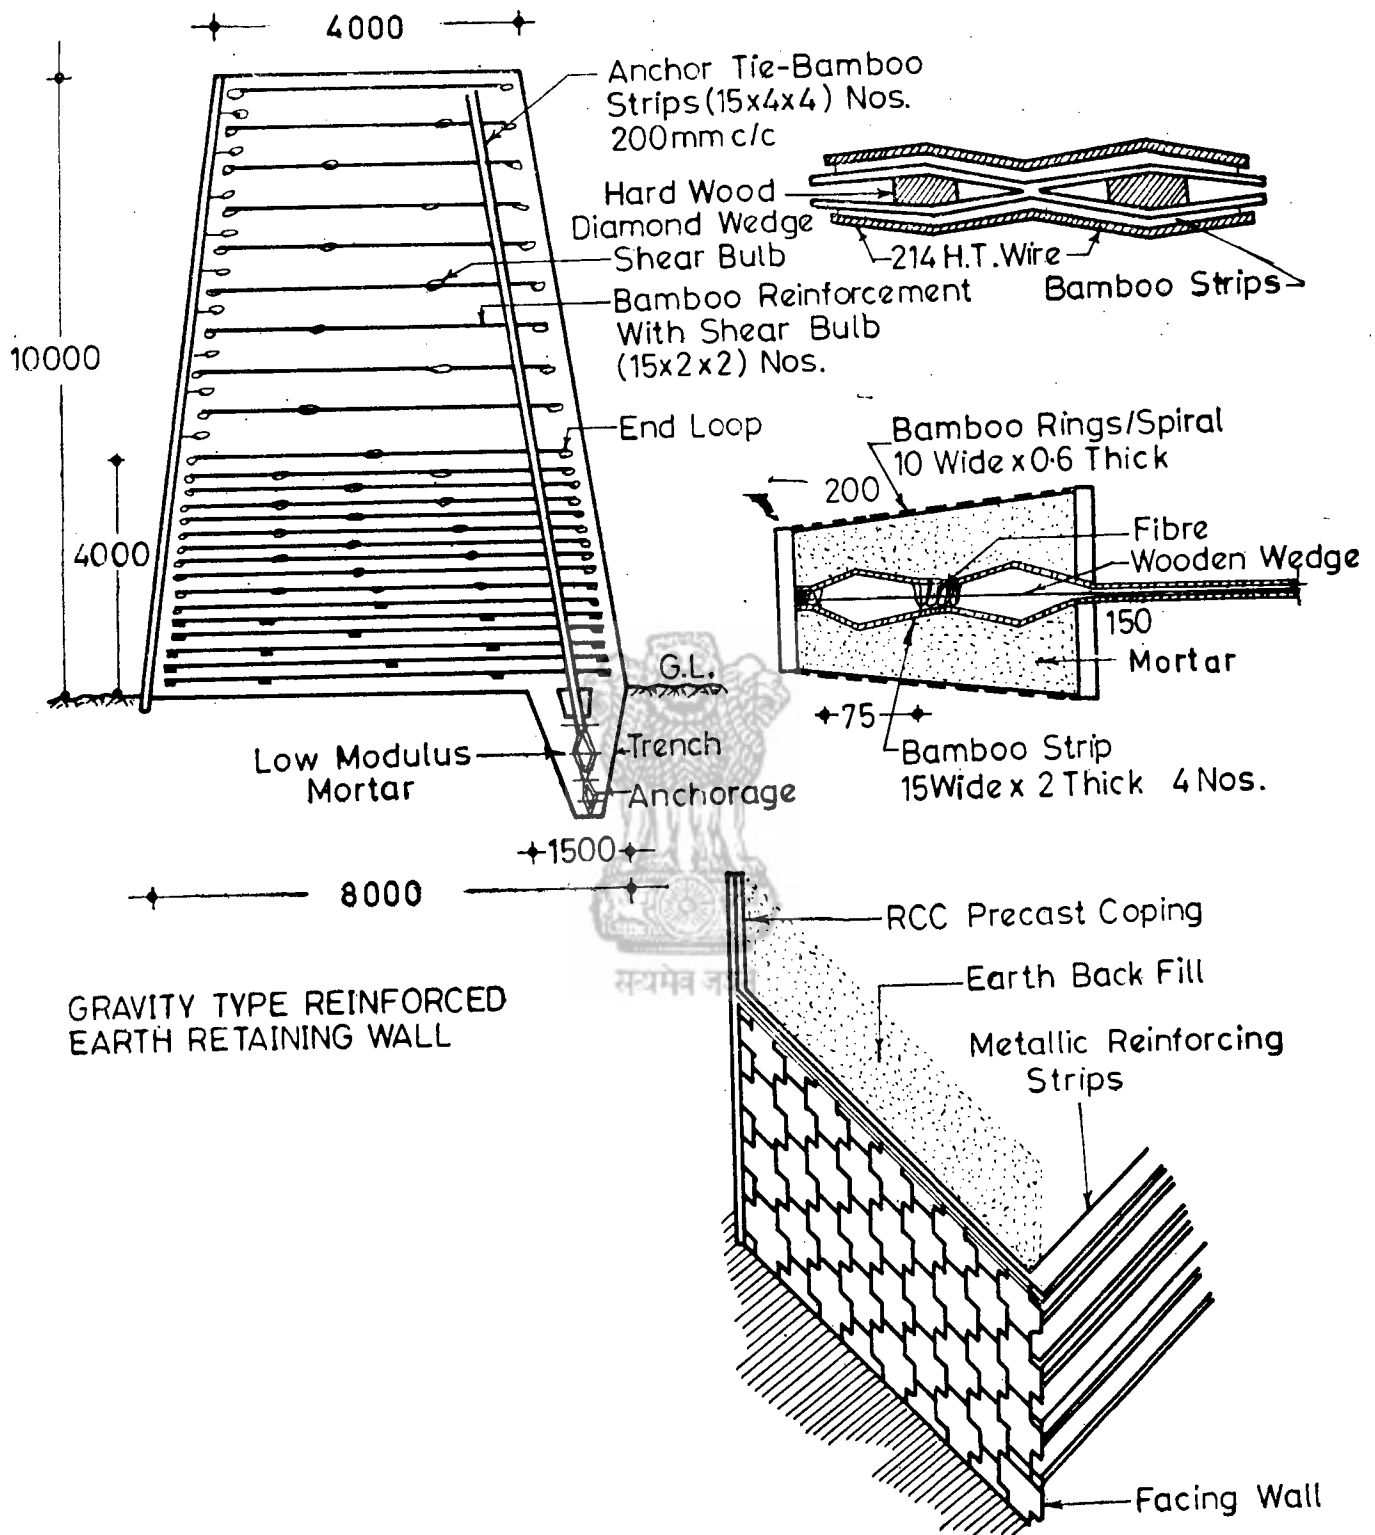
REINFORCED EARTH FOR BRIDGE ABUTMENT
